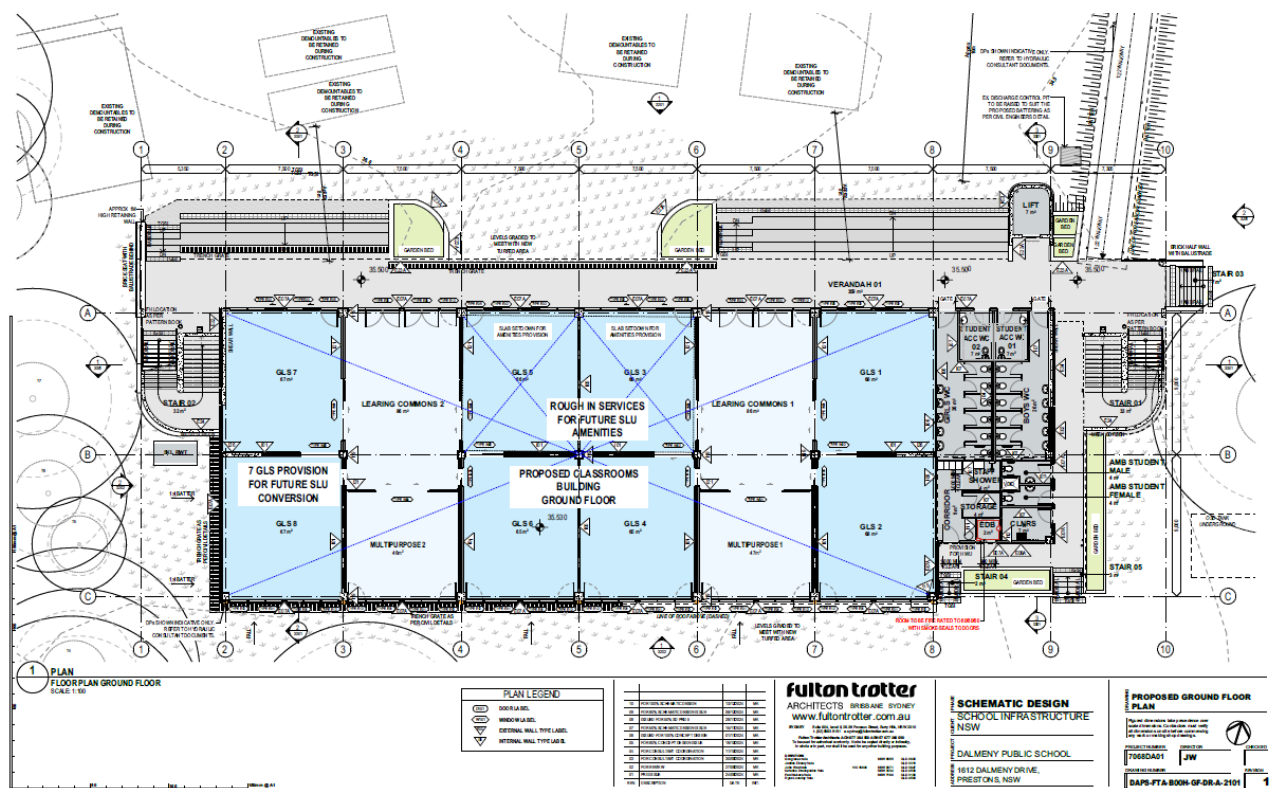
Ground Floor Level Plan. Source: Fulton Trotter Architects
